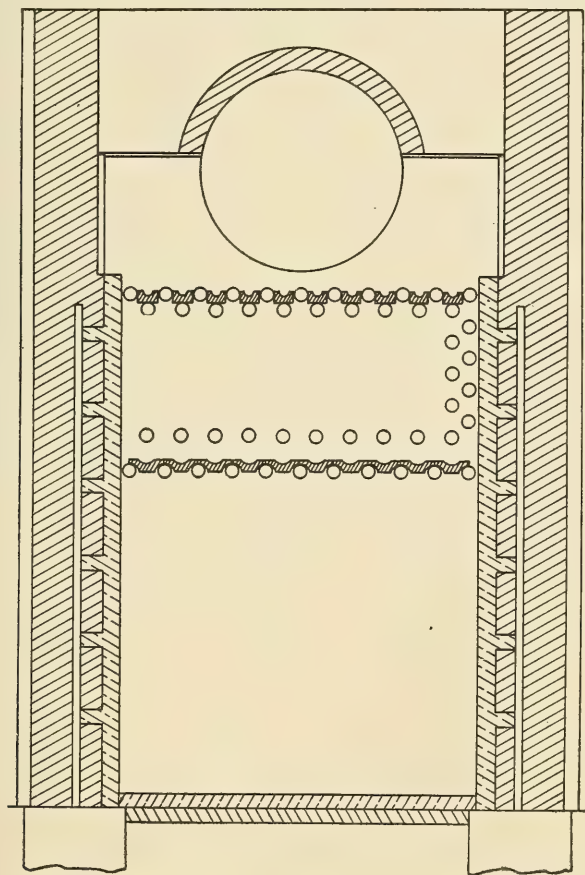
CROSS-SECTION SHOWING CONSTRUCTION OF FURNACE ROOF AS MADE FROM *T* TILE
